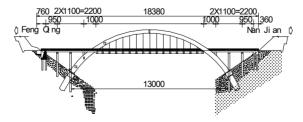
Elevation drawing of Xiaowan Arch Bridge (unit: cm)
